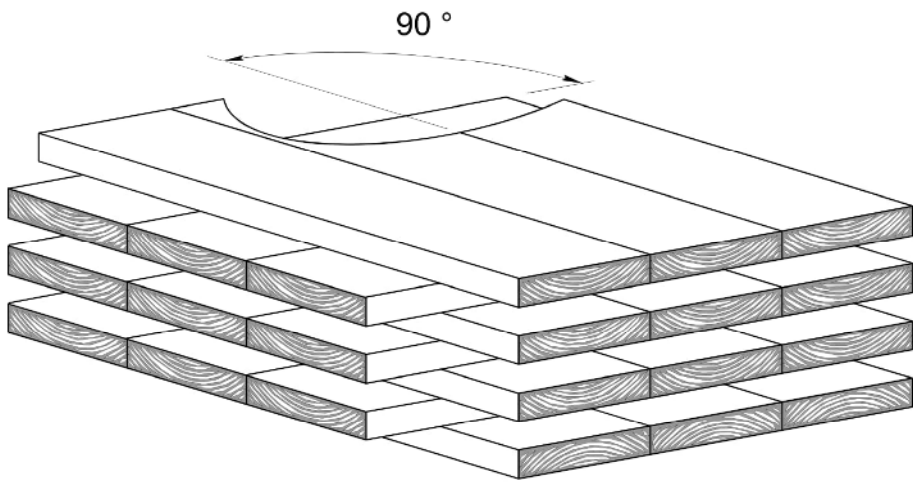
Principle structure of cross laminated timber with 3 layers – Example
